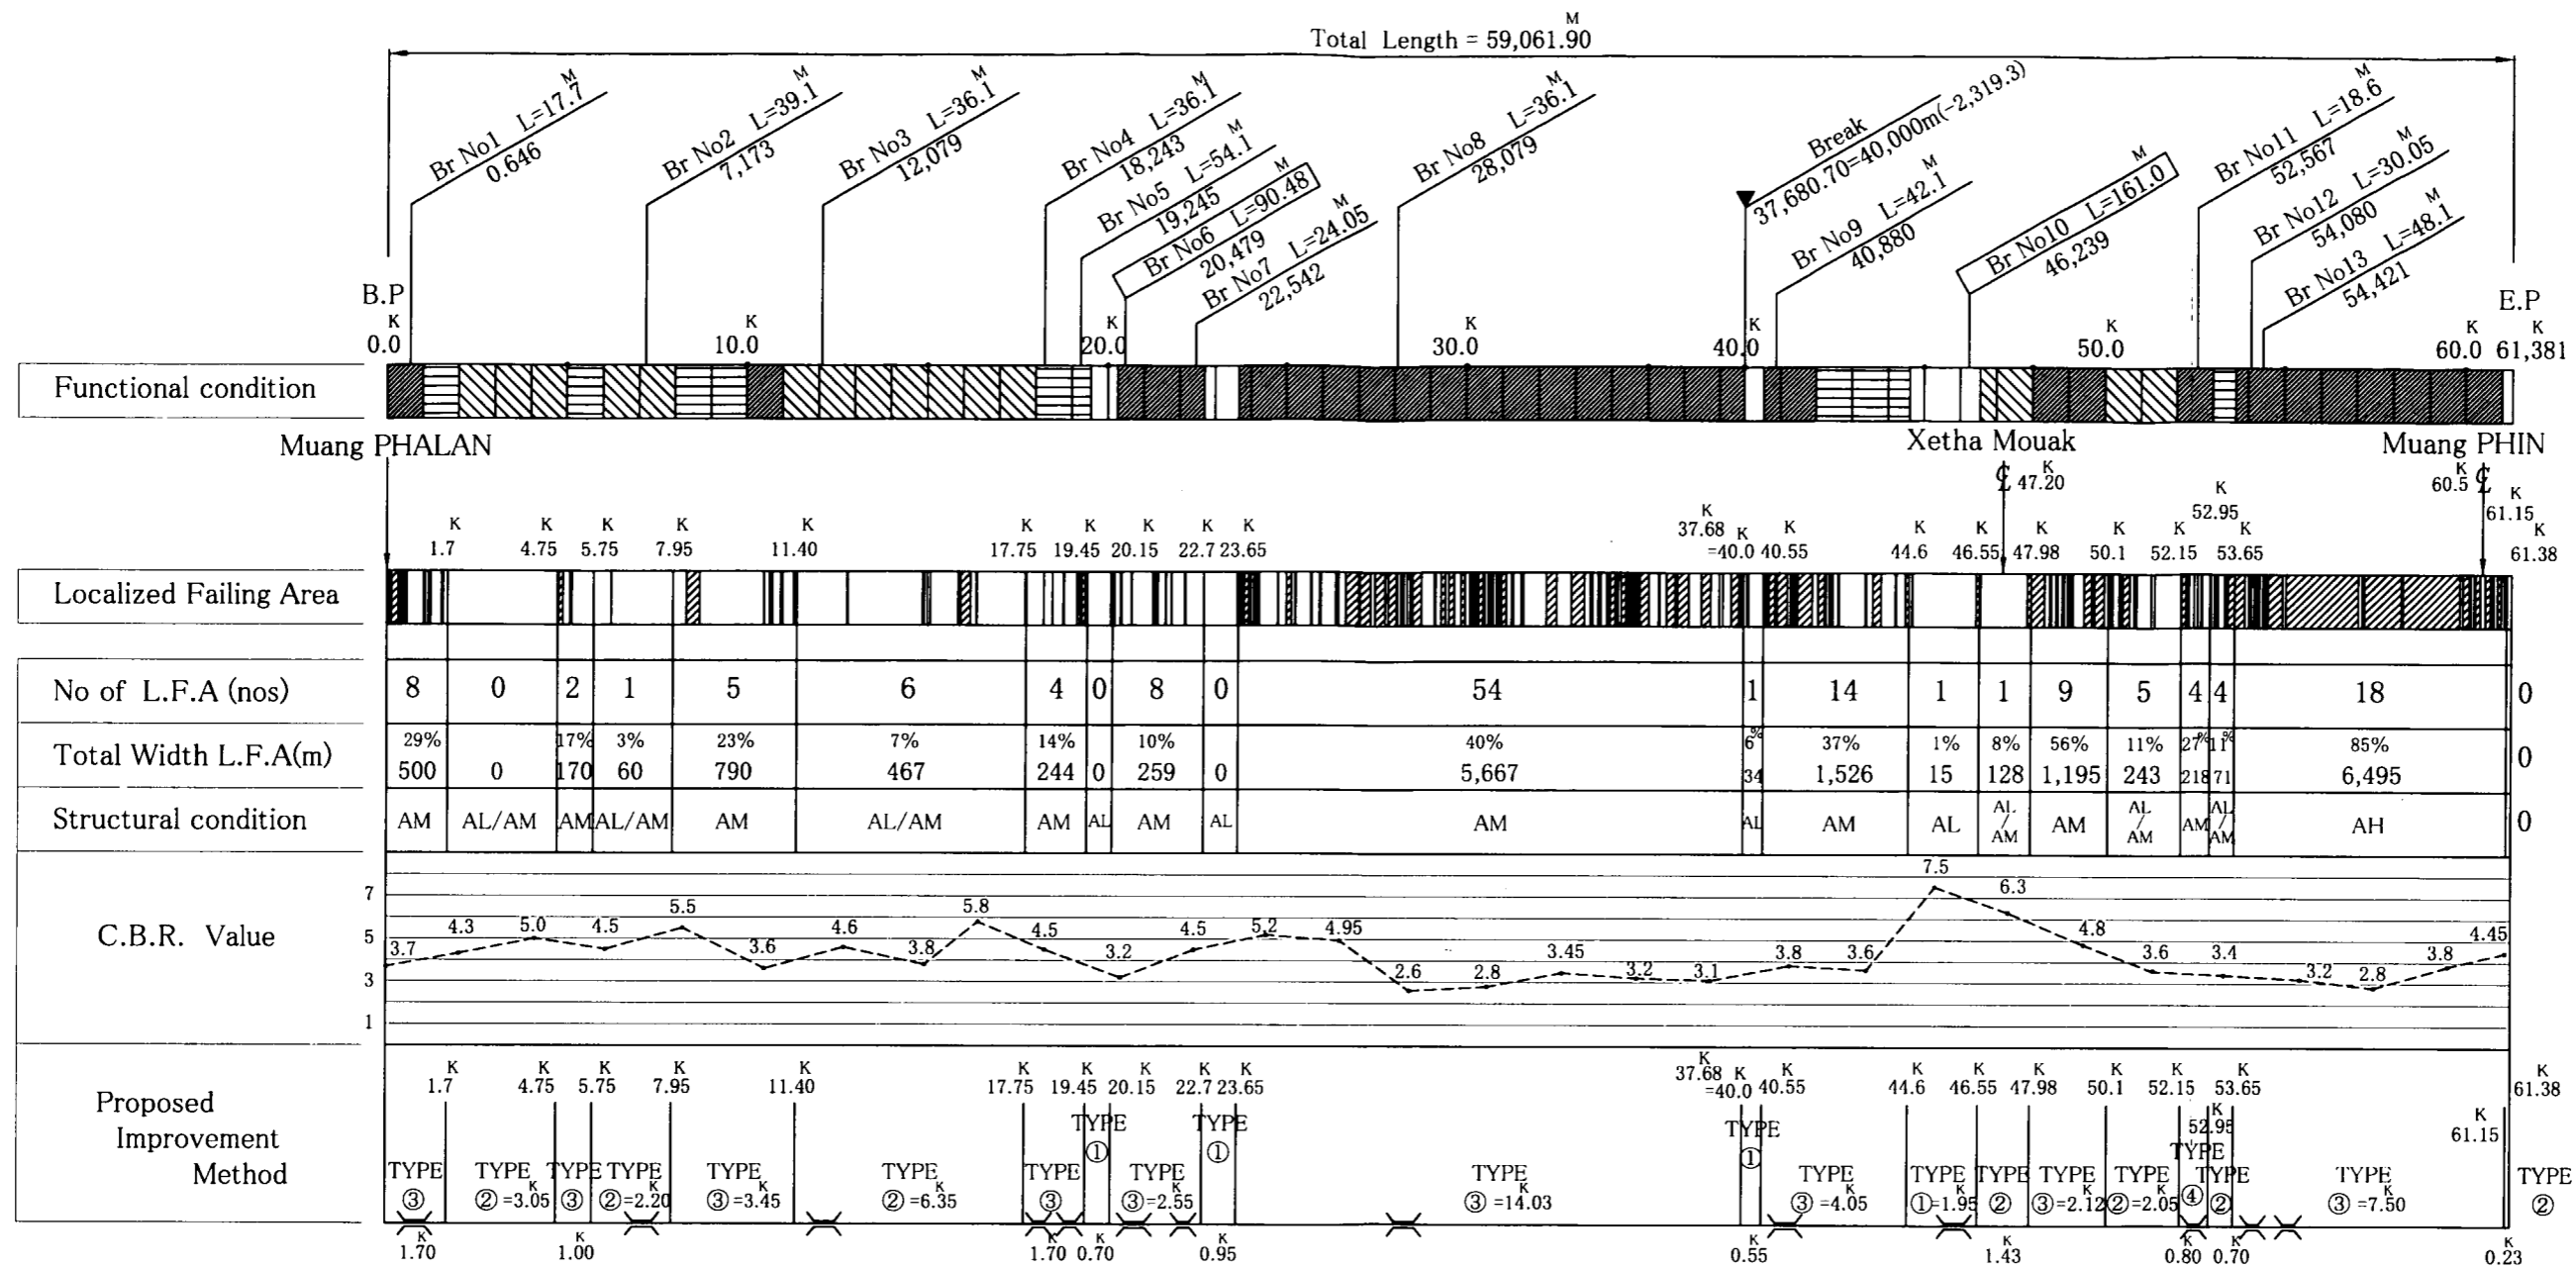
EXISTING PAVEMENT CONDITIONS AND PROPOSED IMPROVEMENT METHODS
